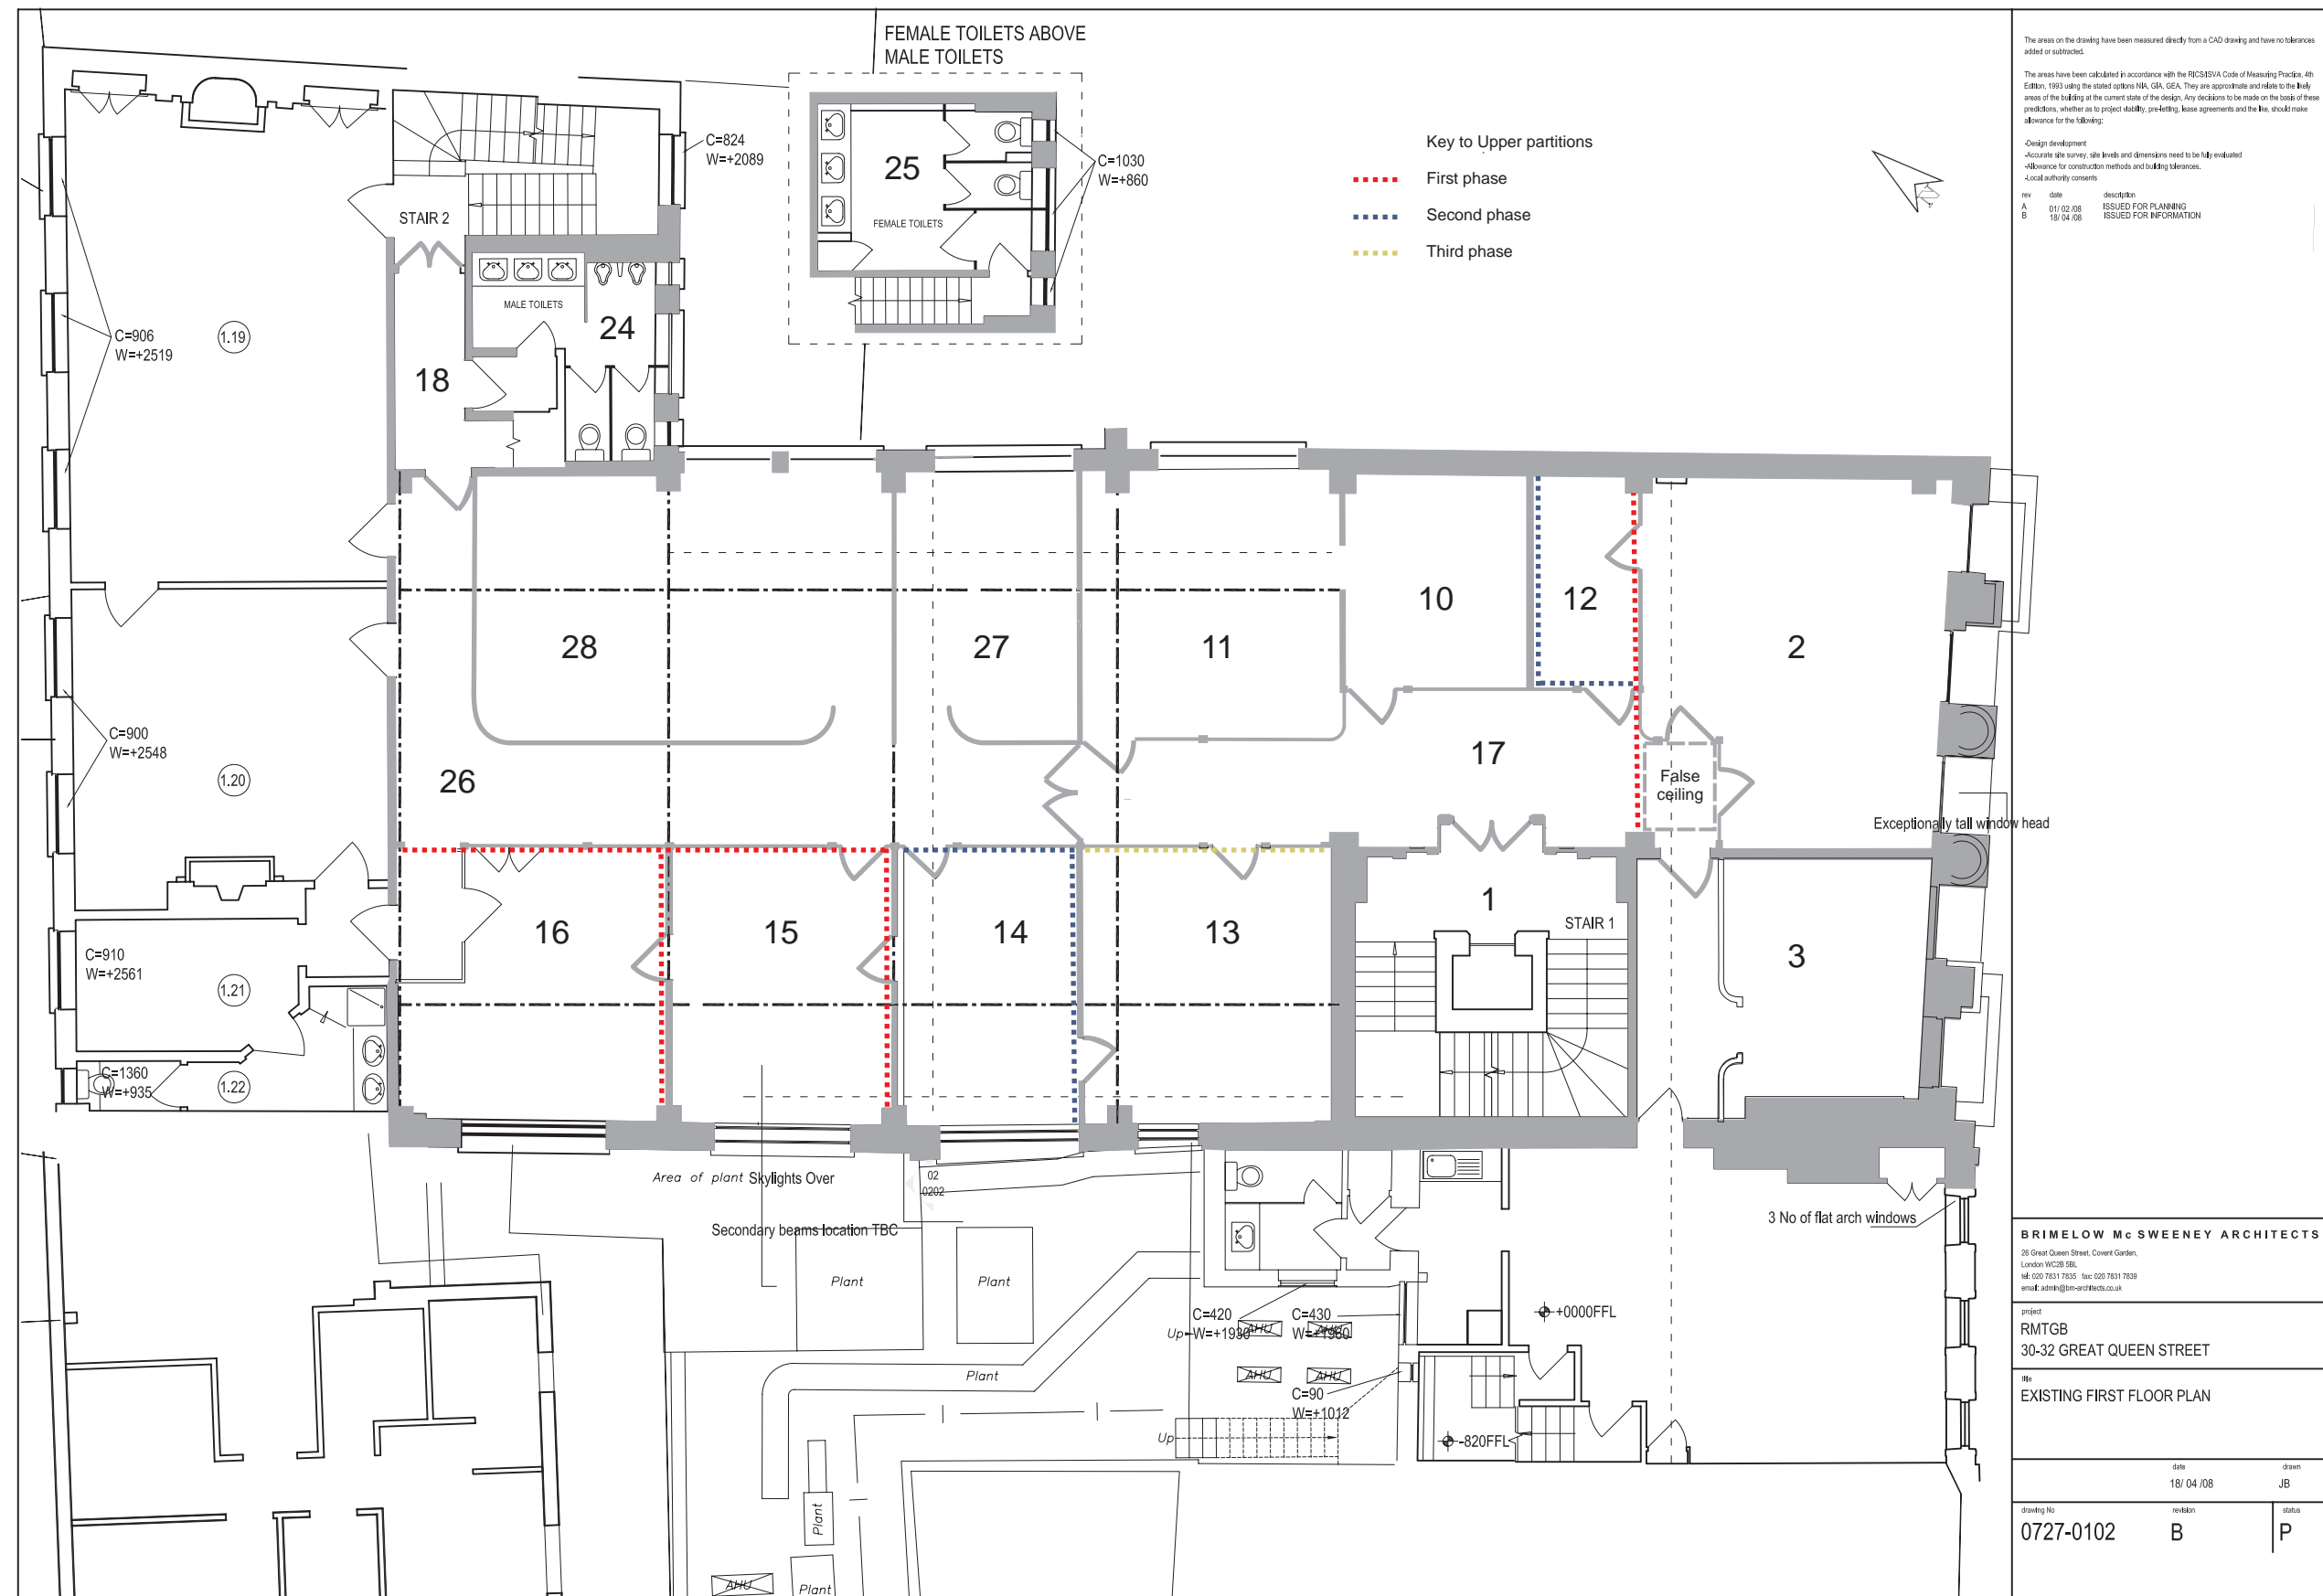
Plan of upper glazing of partition walls on 1st floor at 30-31 Great Queen Street as they are at present
